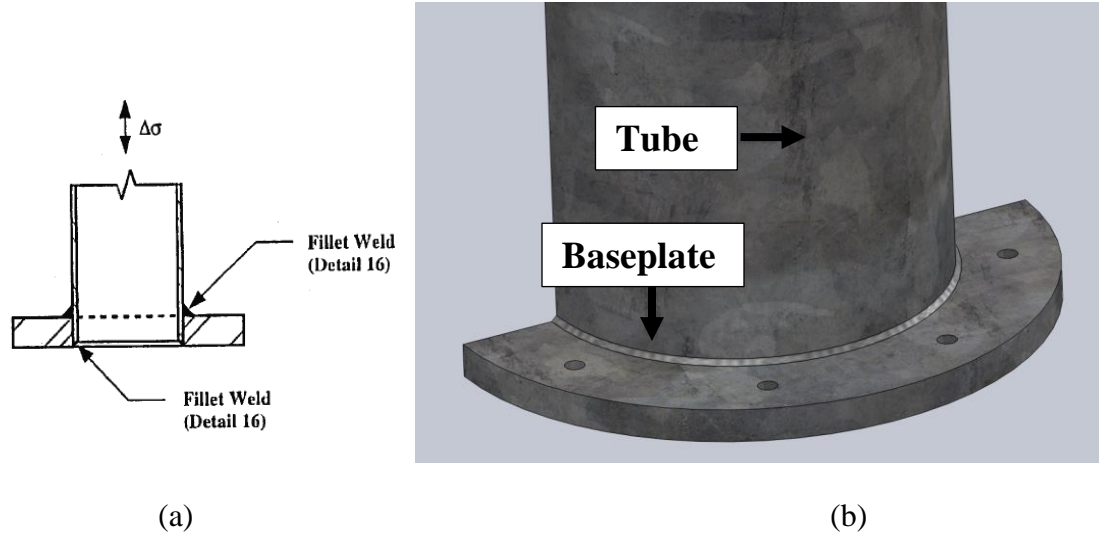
(a) Fillet-welded socket connection (AASHTO, 2001) and (b) SolidWork
